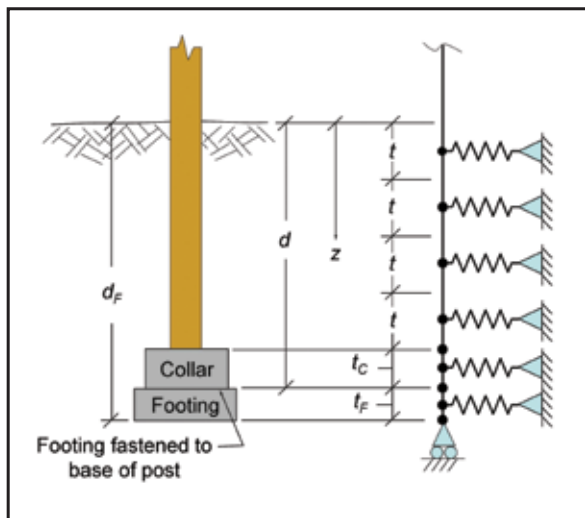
Two-dimensional structural analog for a post or pier foundation. Different soil springs are used to model soil acting on the collar, attached footing, and post or pier because of the difference in width of the three foundation elements.
